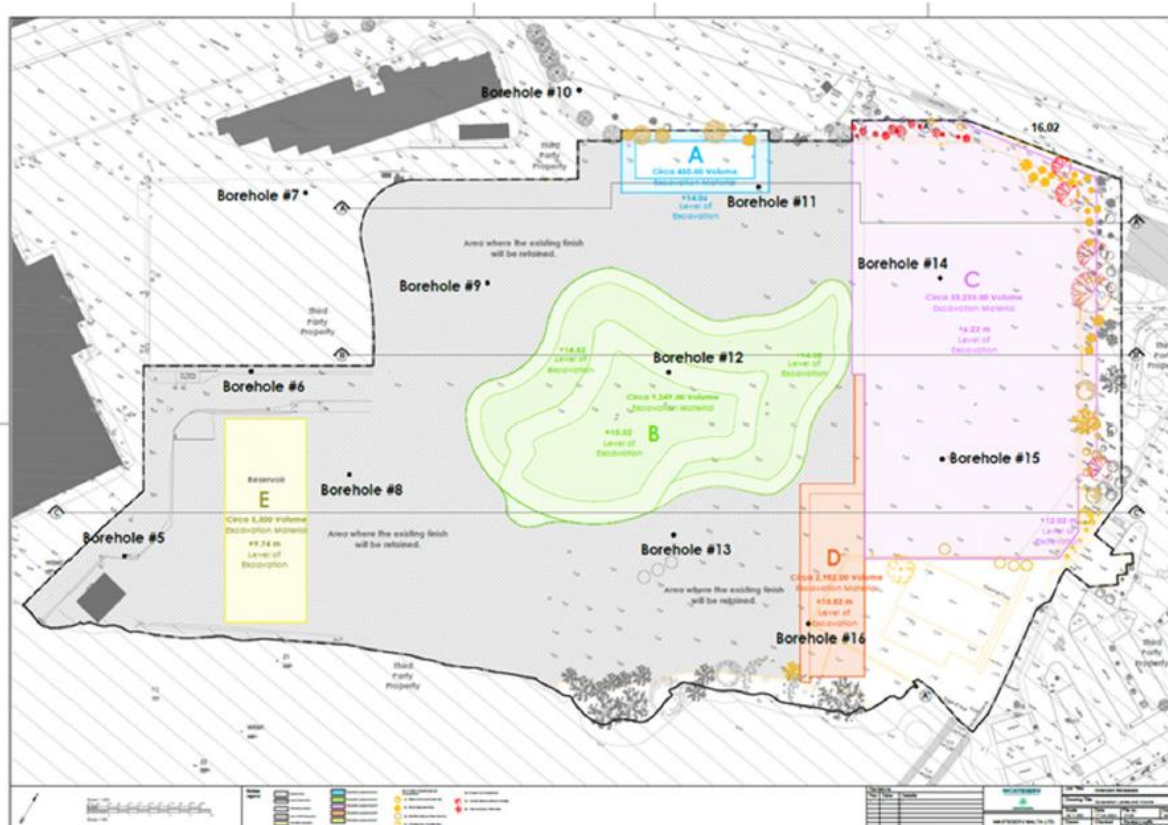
Plan illustrating excavated areas and location of boreholes (Source: PDS)
